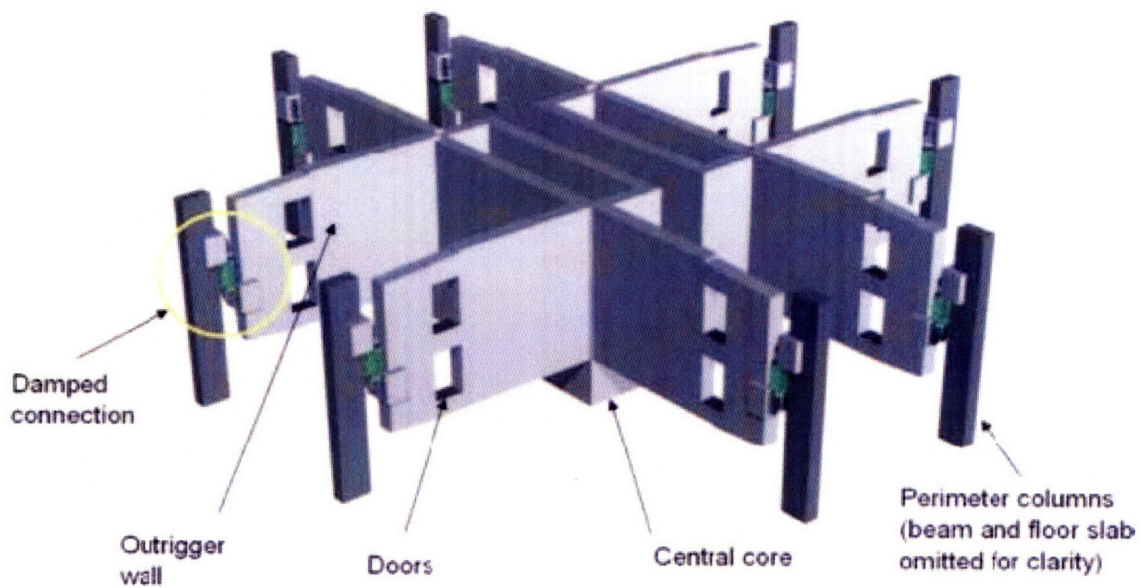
Typical layout at outrigger levels (Smith & Willford, 2007)
